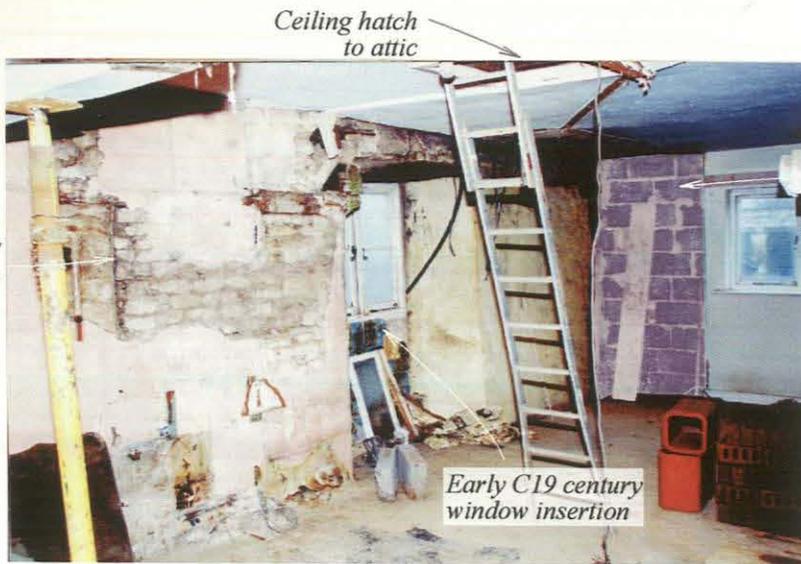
Rooms 65/15-16, no.65, looking southwest; view of the first floor space after the removal of bathroom 65/15 partition panels during "opening-up" work. Note the exposed breeze blocks within the rebuilt, west gable end wall.
